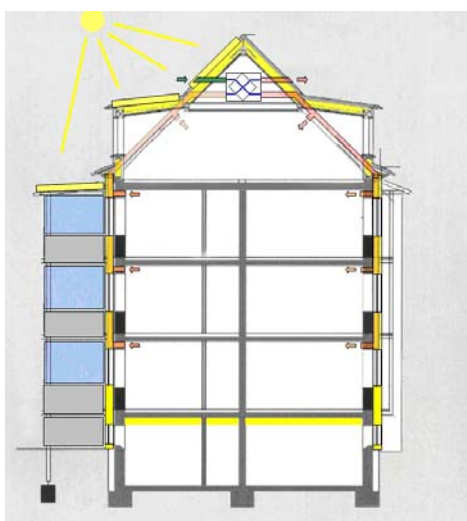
Prefabricated façade modules are used to construct a new building envelope around the building. This is physically optimal and does not reduce available space.
